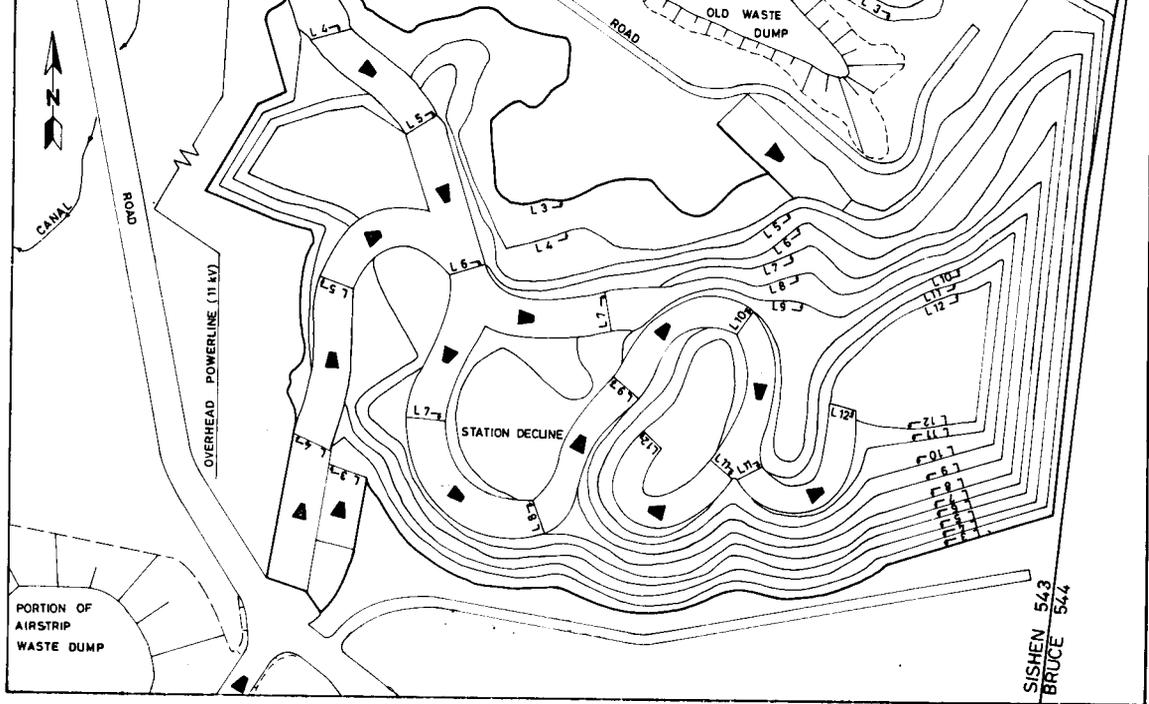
Portion of the long-term plan for South Pit (scale 1:5000)
